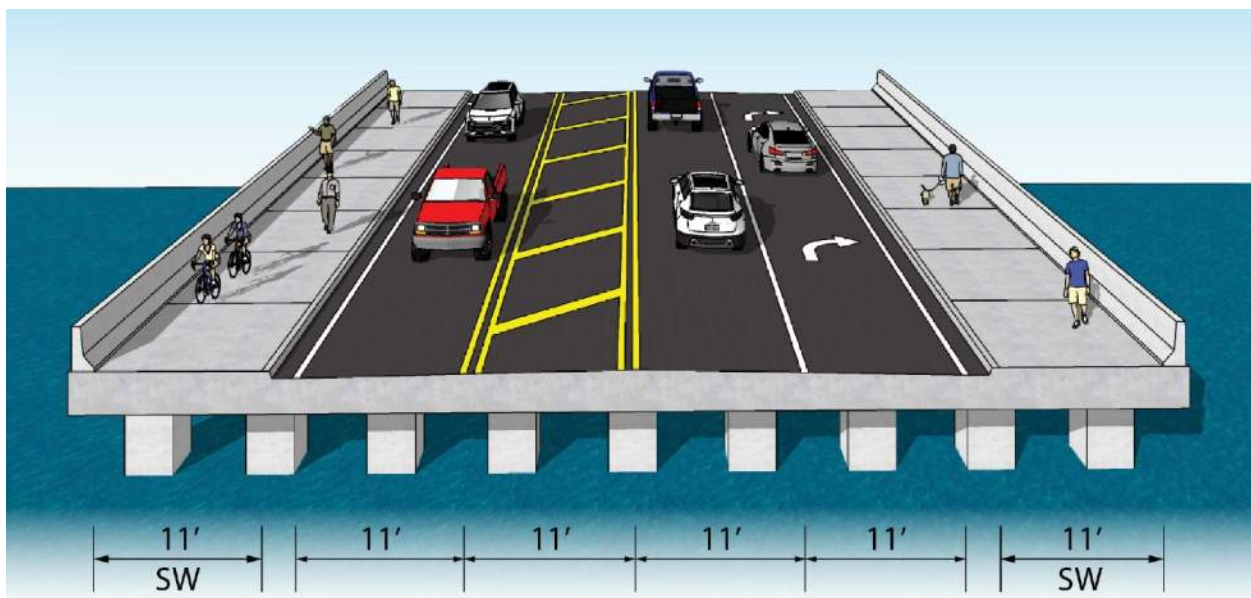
Proposed Typical Section from Drew Street to Marshall Street
